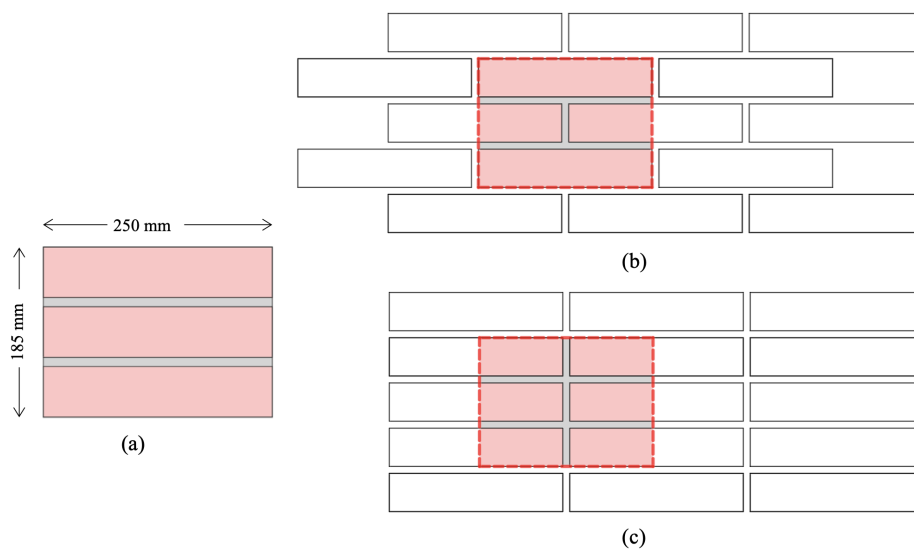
(a) The standard triplet specimen (b) Running bond masonry, with the modified running bond triplet proposed (c) Stack bond masonry, with the modified stack bond triplet proposed
